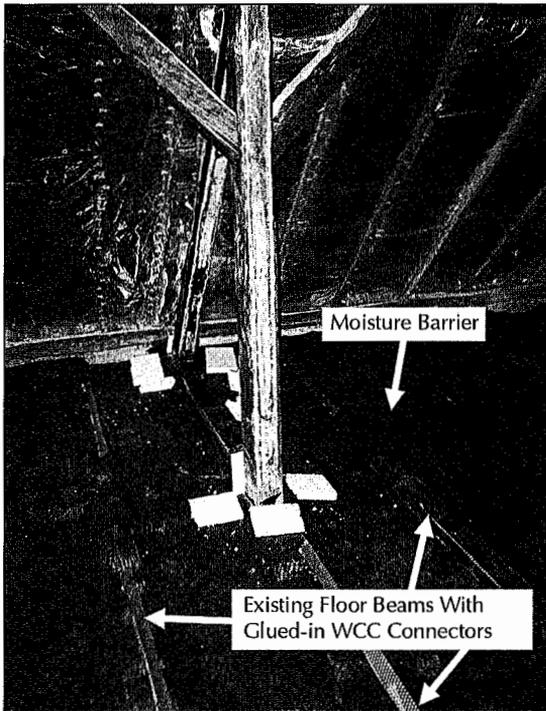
A photo of an attic floor structural upgrade of an historic home in Aschaffenburg, German, using wood-concrete technology.
